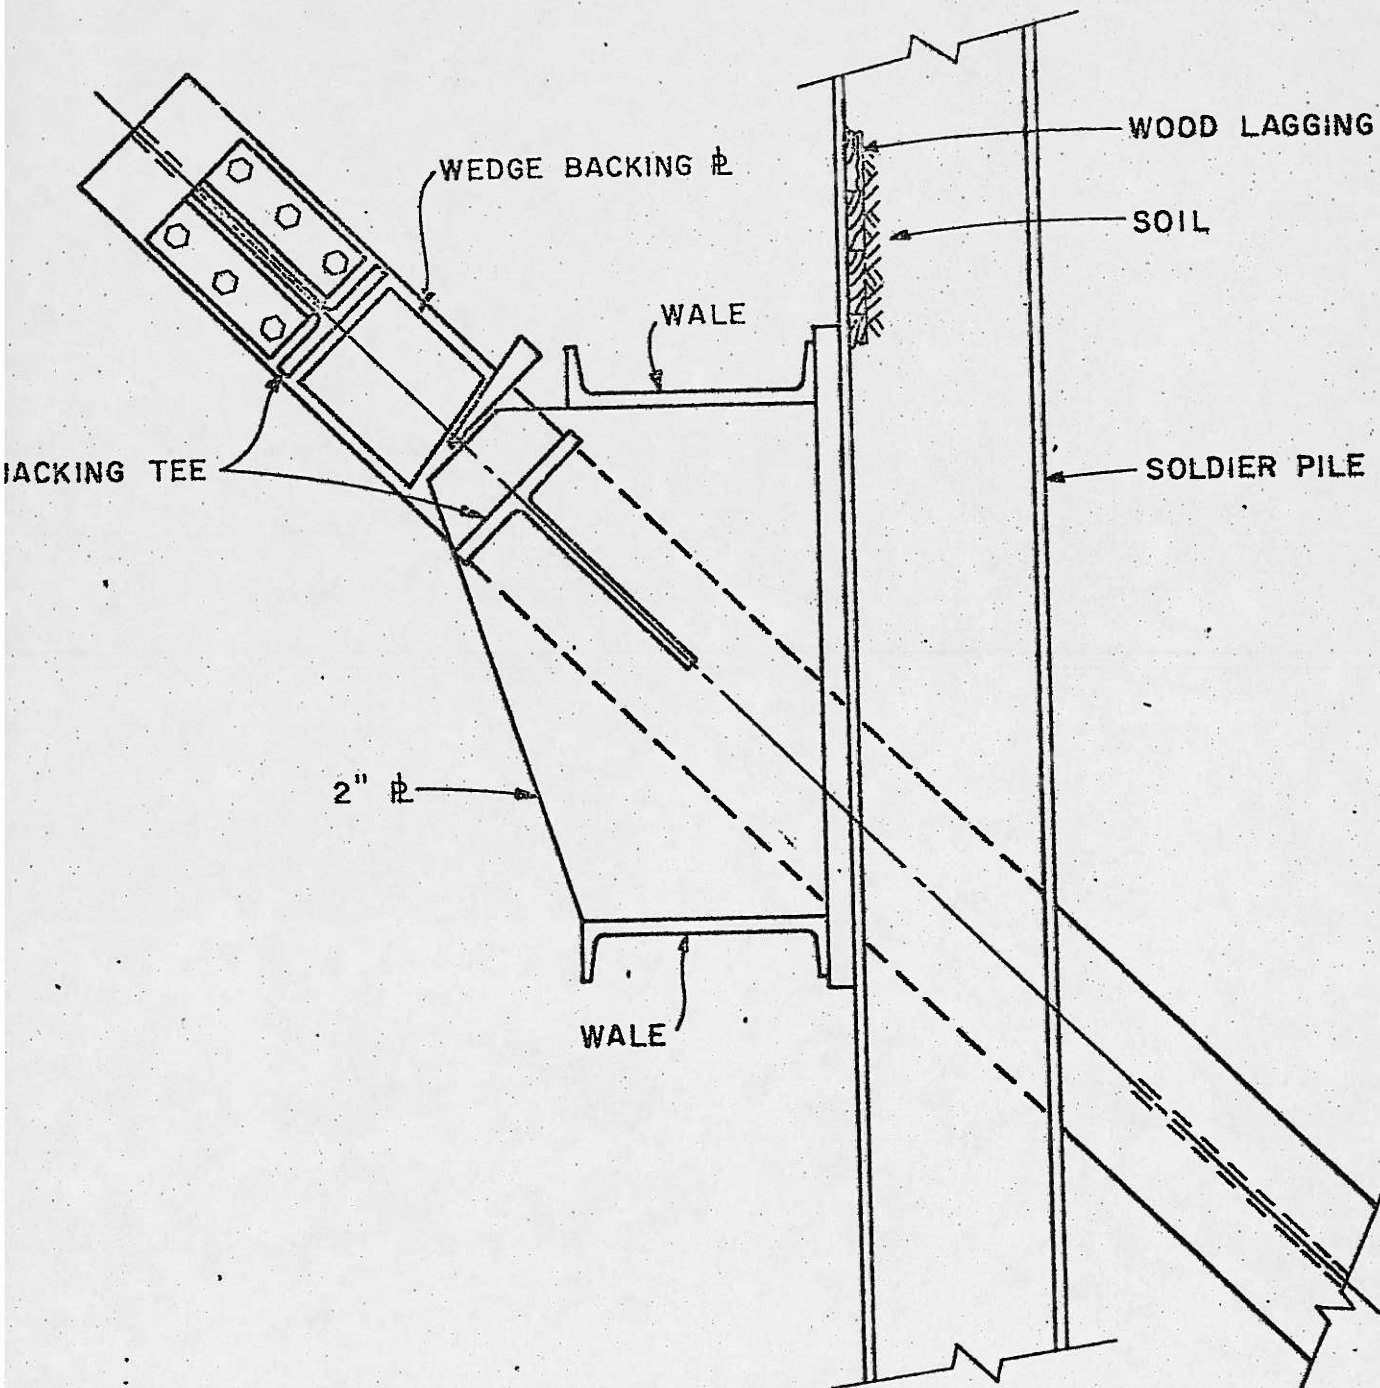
DETAIL OF H-PILE TIE-BACK TO WALE CONNECTION
